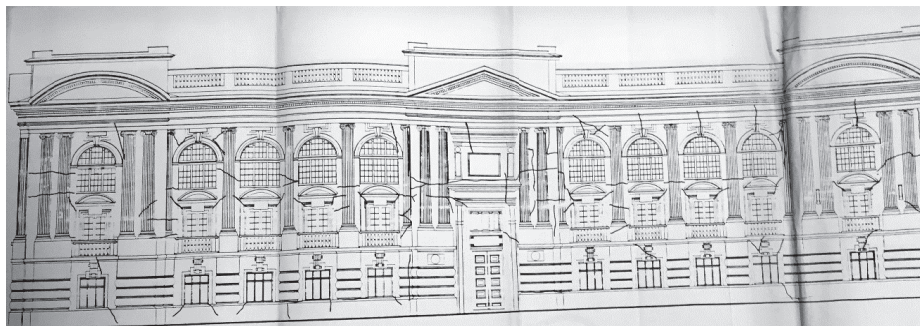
Elevation Yungay street fissures lift, year 1987. Source DOM.
